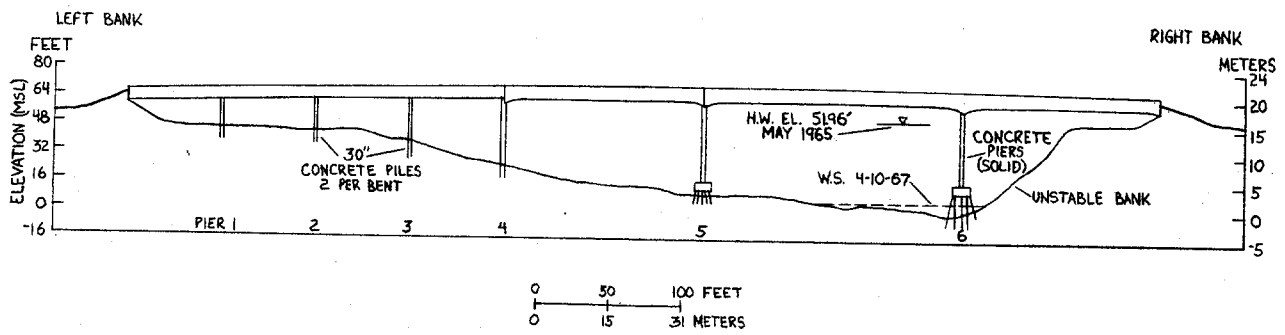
Cross section of Brazos River channel at bridge, in 1967.
